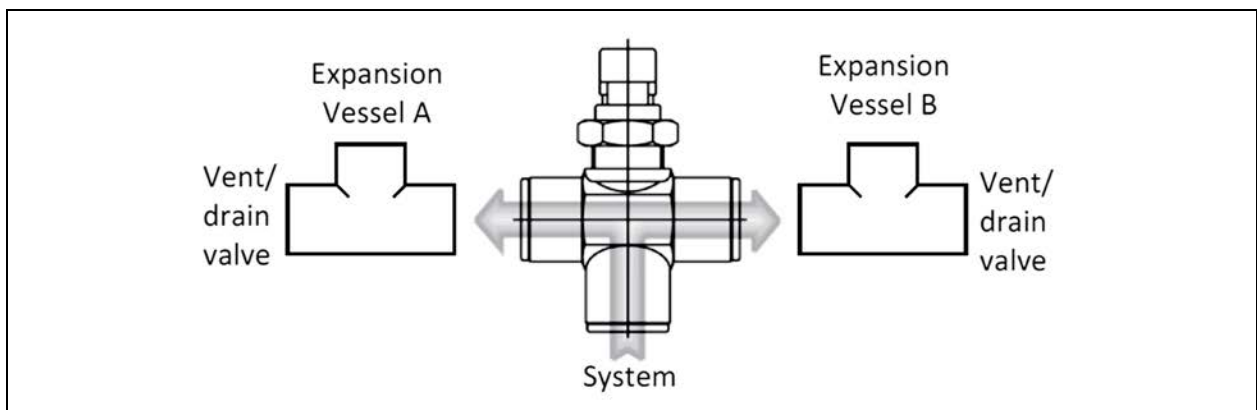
3-Way Valve Handle Set to Expansion Vessel B
